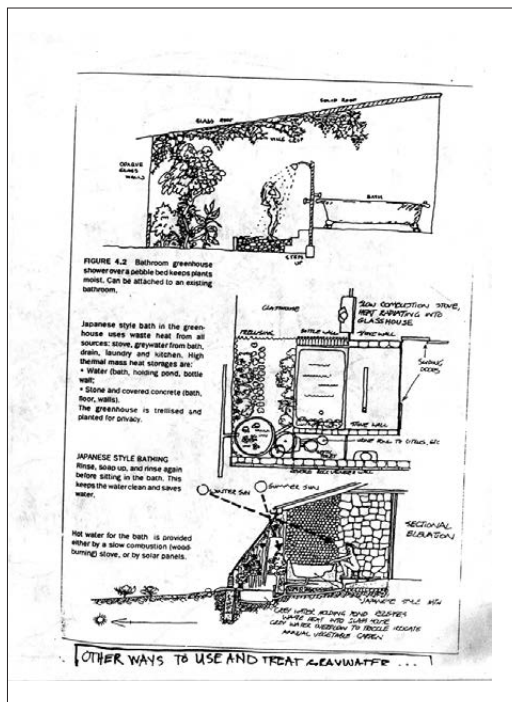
Bathroom greenhouse shows more public facilities plants moist. Can be attached to an existing bathroom.
